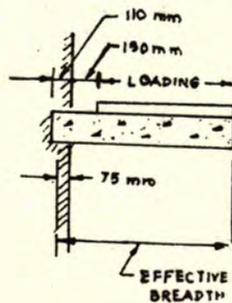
LOADING ON STAIRS BUILT INTO WALLS
